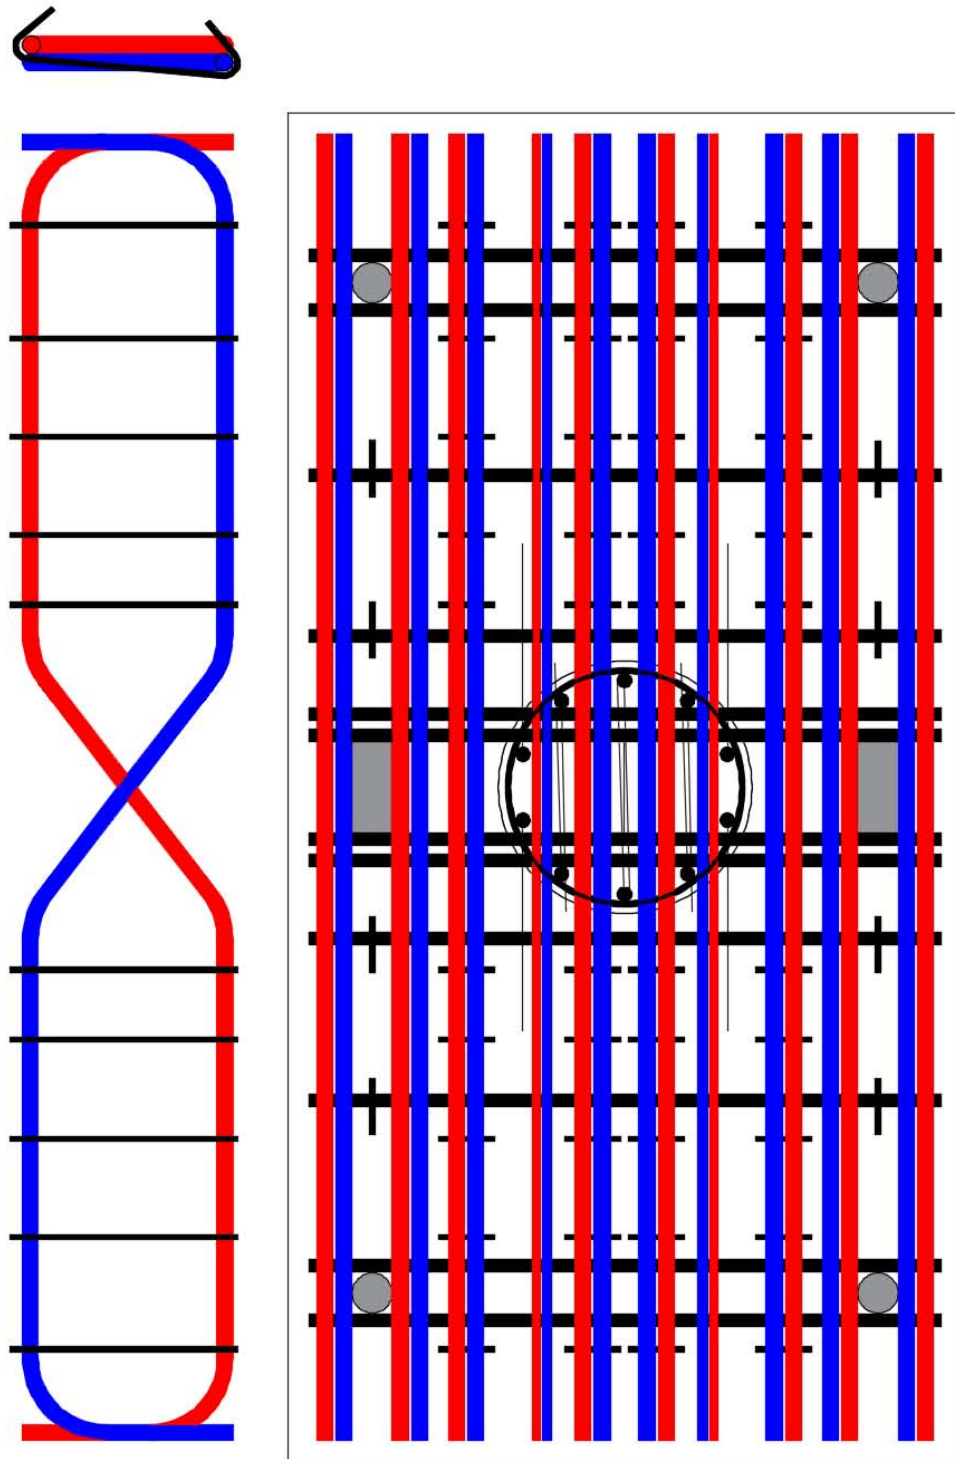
Footing Reinforcement Details for 18" Diameter Specimens
